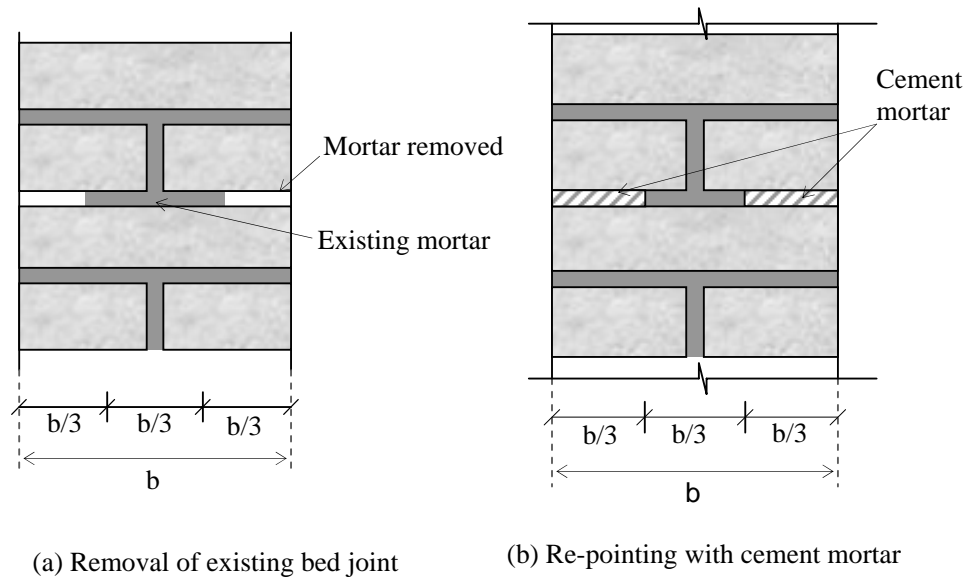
Section of wall strengthened by re-pointing of bed-joints
